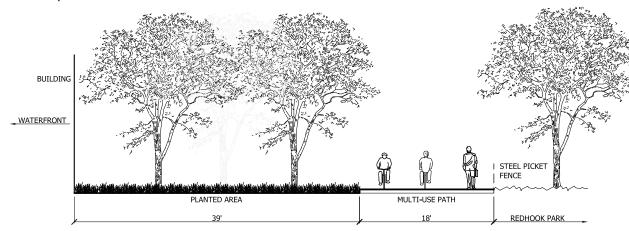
Possible Configuration for Halleck Street between Court Street and Clinton Street
